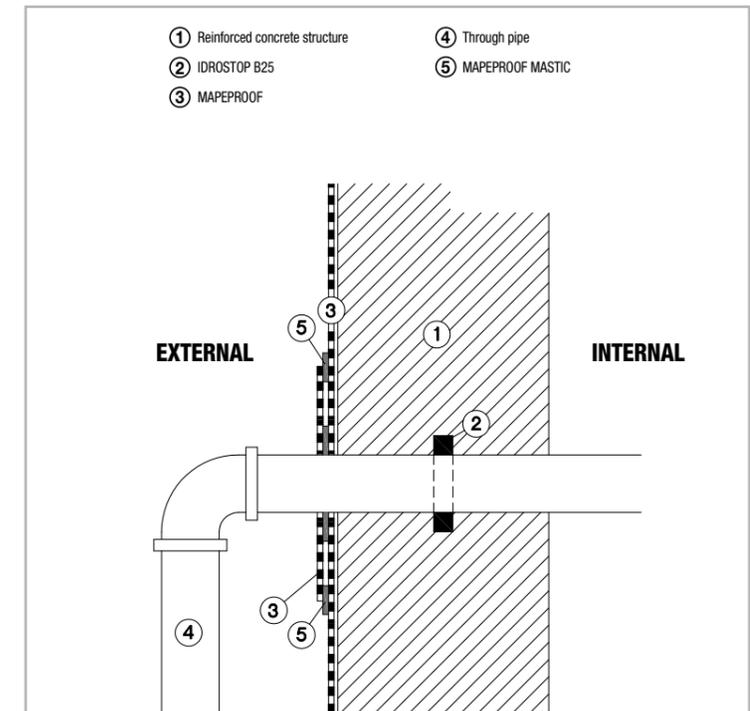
Detailed layout of sealing a pipe which passes through a facing wall
